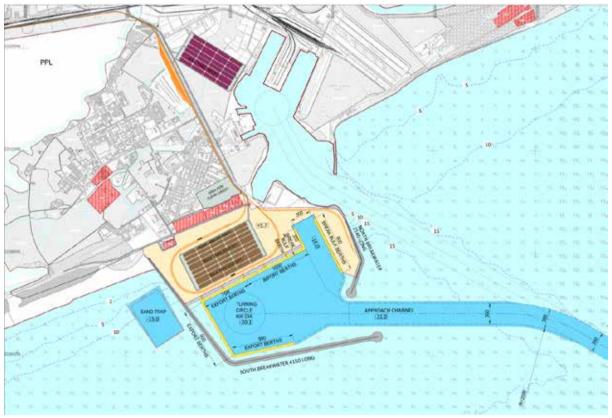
Master Plan Layout for Proposed Outer Harbour
